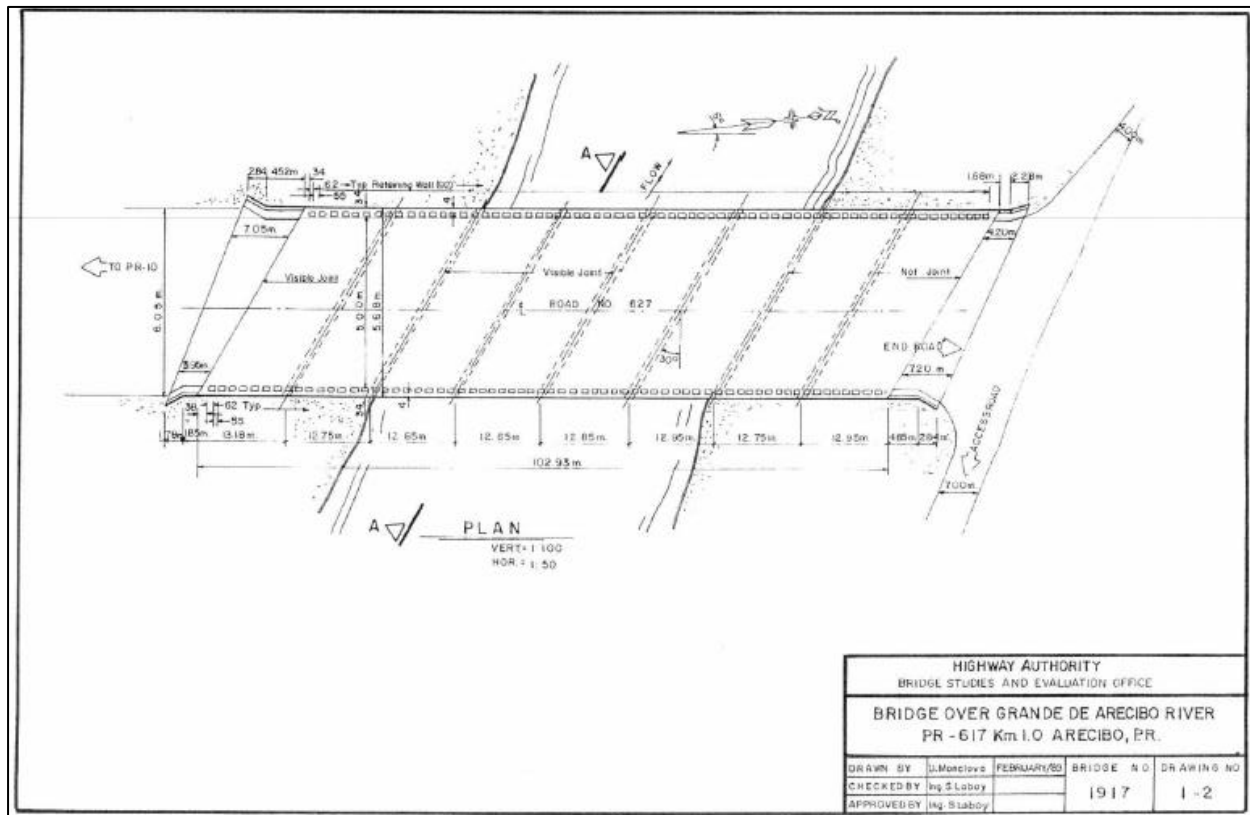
Bridge 1917 drawings (source: PRHTA)
